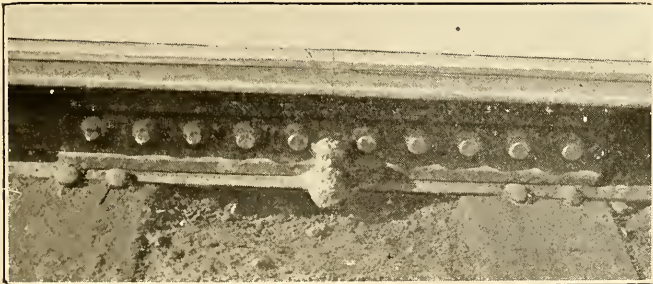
Completed Modified Clark Joint, Showing Weld of Base.
